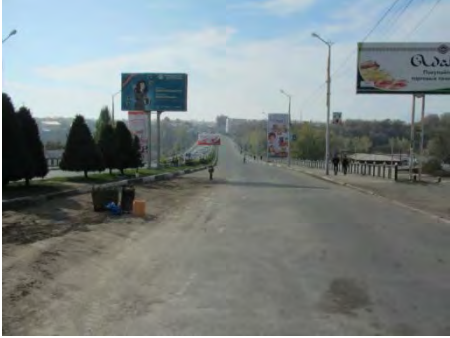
Photos of the Bridge on Navoi St. (1/2)
